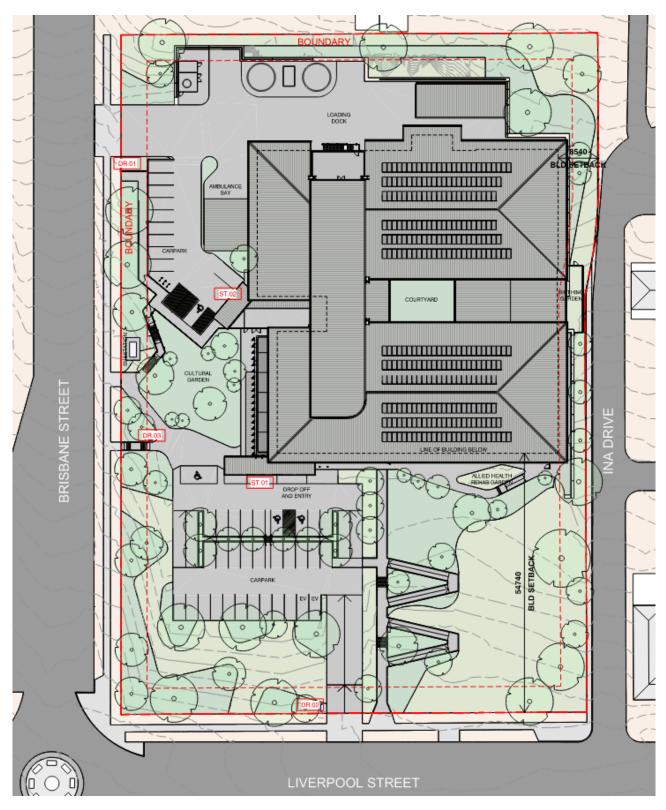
Site Plan Source: DJRD Architects (130734-DJRD-AR-REF 01 [G] 18/12/22)
